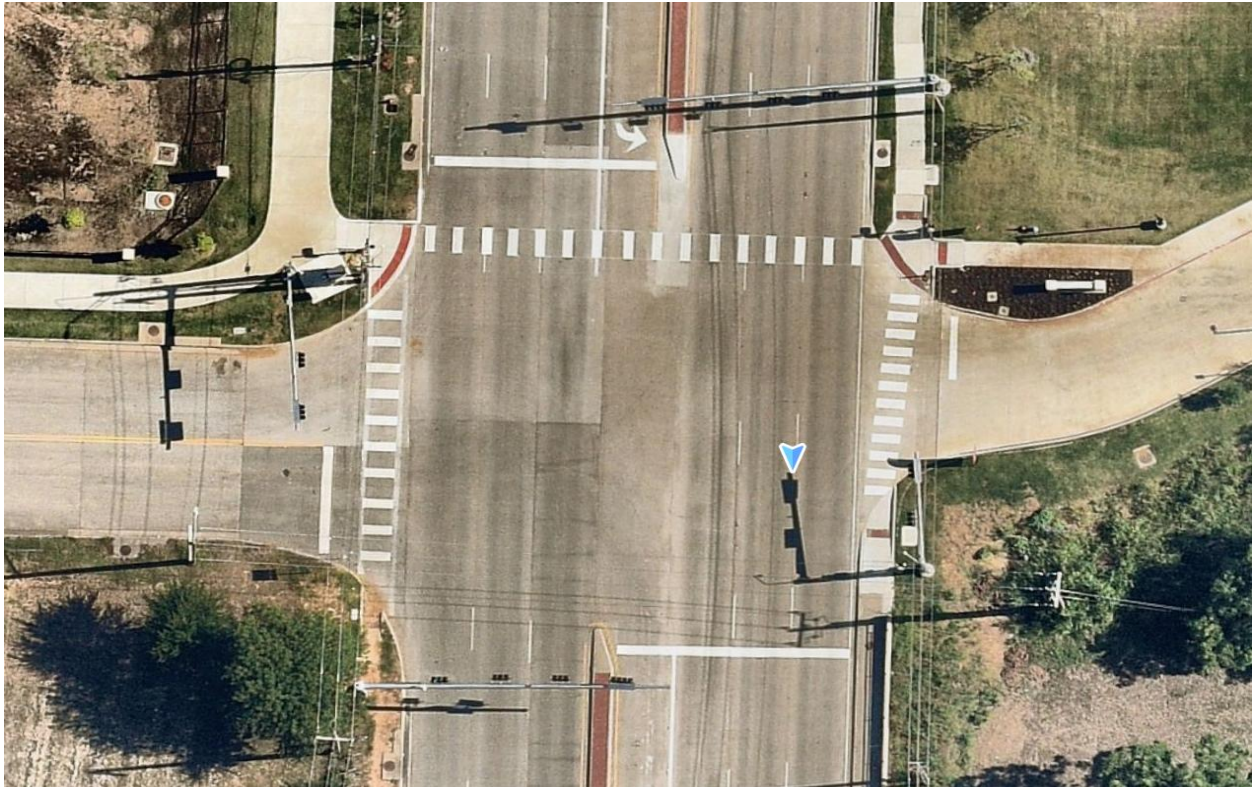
Part B: Duchess at Loop 288 – Clear View of Intersection Improvements (After Installation)
